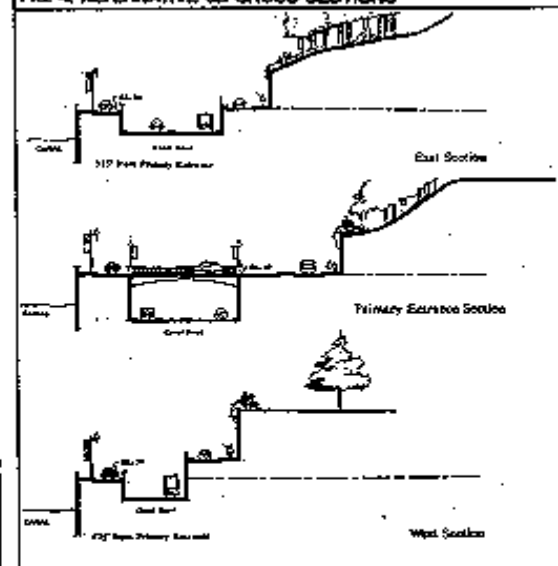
ALTERNATIVE 3H CROSS SECTIONS
